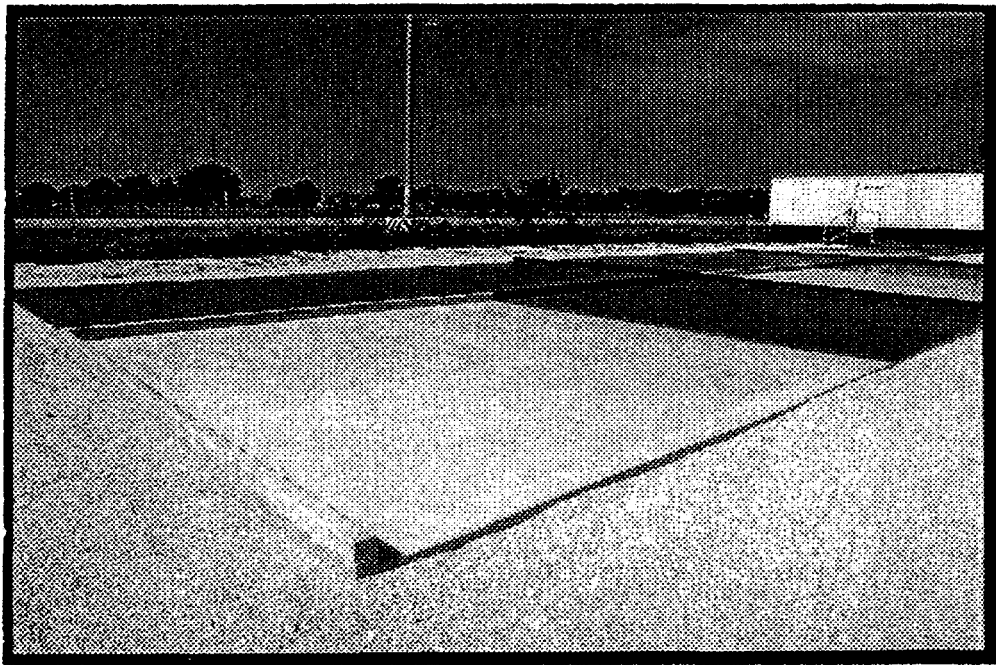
Concrete "floor" test site at Florida International University with individual section for each technology
